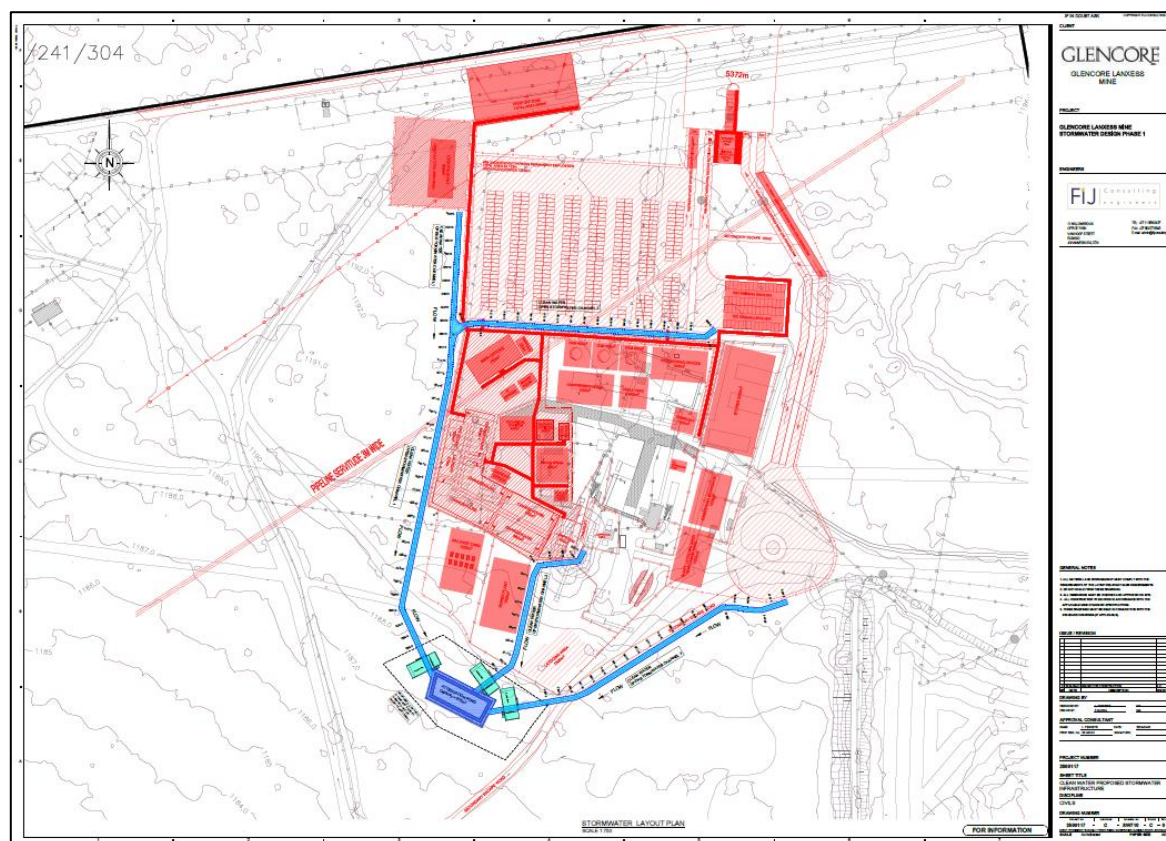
Detailed layout for the proposed project (EIMS BID, 2024)
